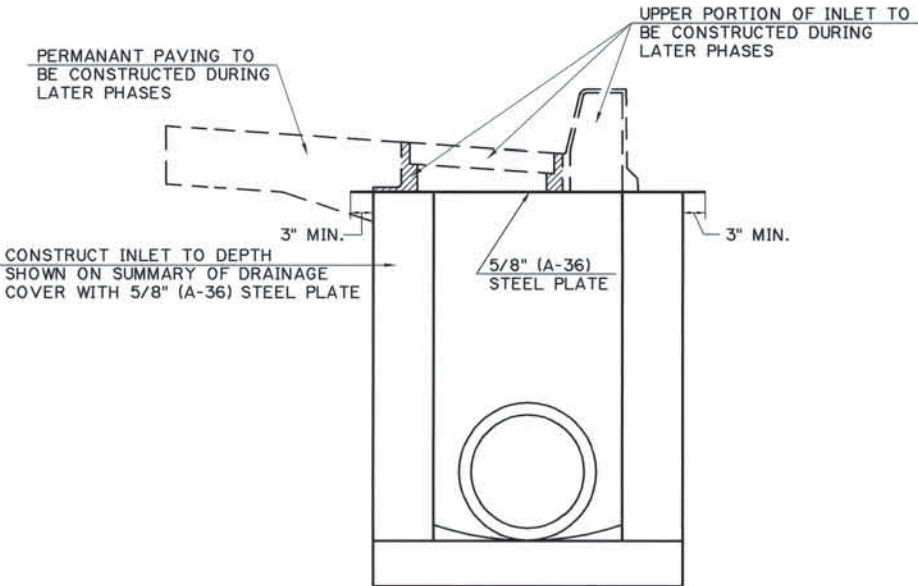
DETAIL OF EXISTING INLET REMOVAL DURING DETOUR PHASING
